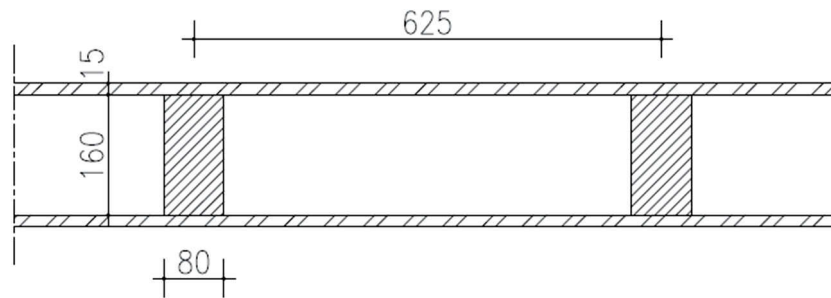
Section of the timber floor of reference building, made of glulam beams and OSB panels.
